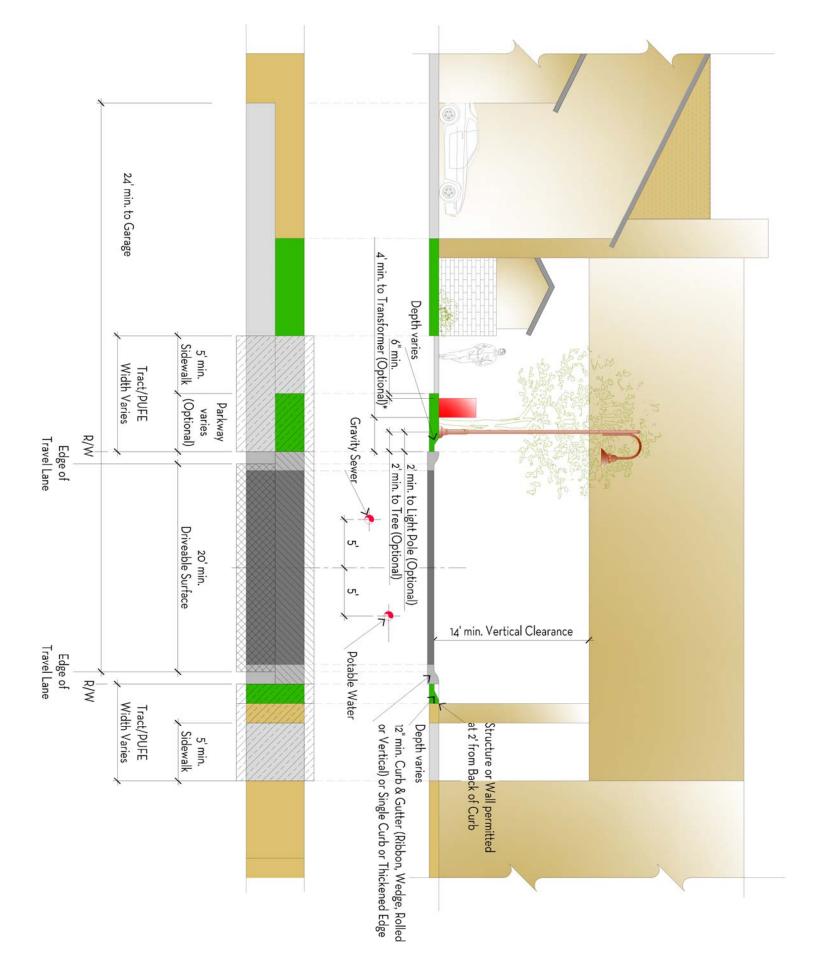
Two-Way Two Lane District Street - Detailed Cross Section
